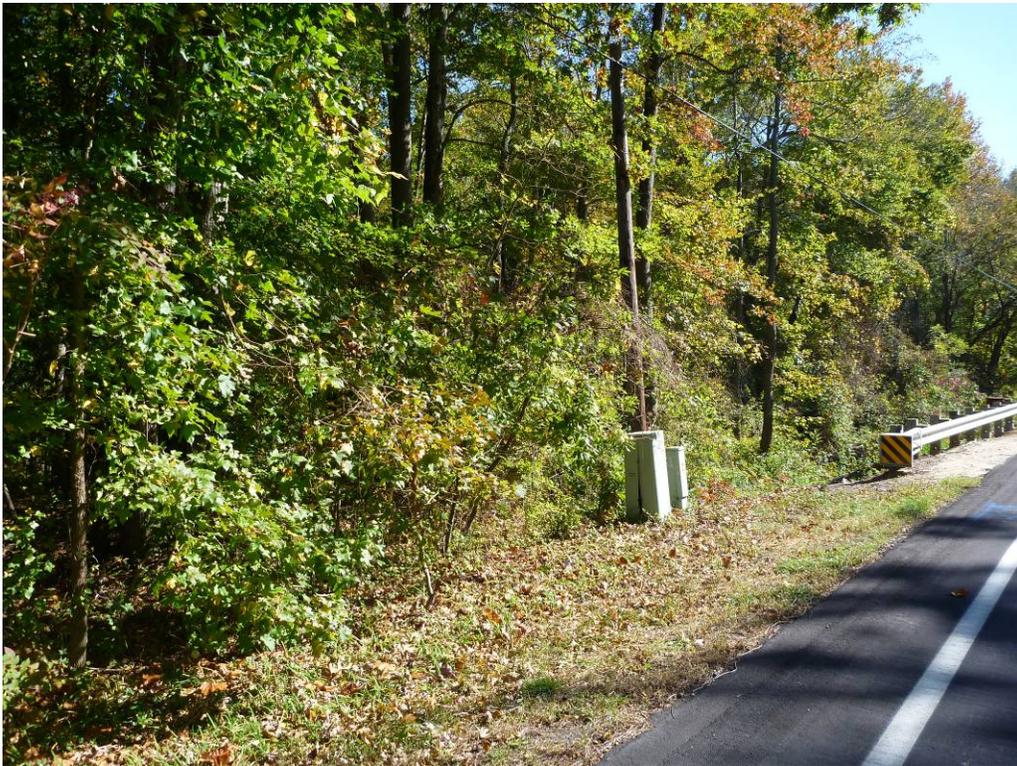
Overview from the center of the APE at Bridge 2-104A, facing southeast.
